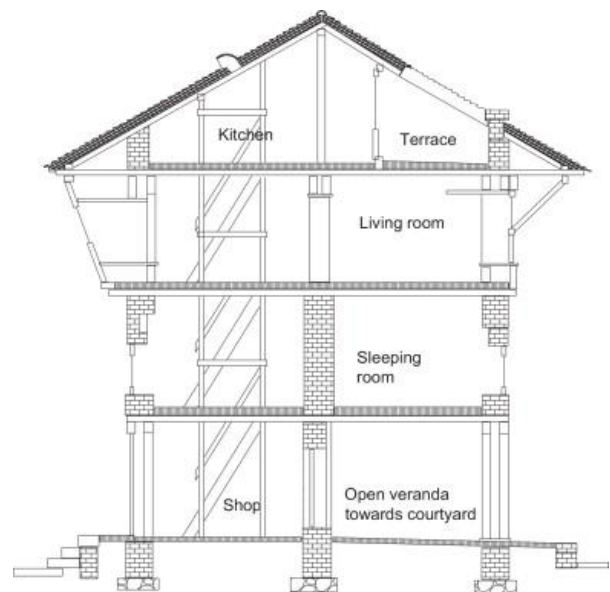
section of Newar house, source: <http://www.sciencedirect.com>
